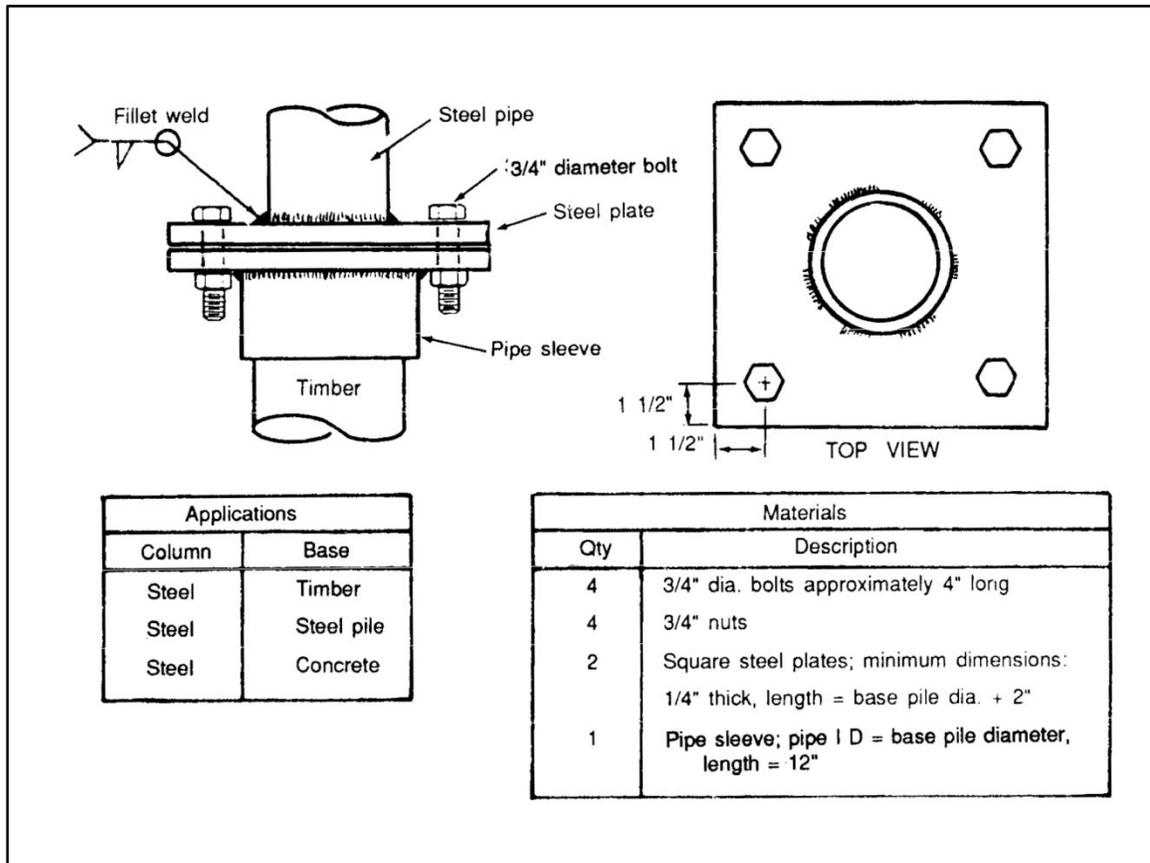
Joining steel column to base pile, column to base connections (connecting method 5)
